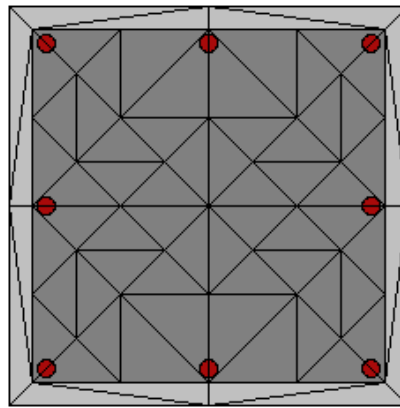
Rectangular column C 0.45x0.45 (8 No.20) fiber section for 8 story.
